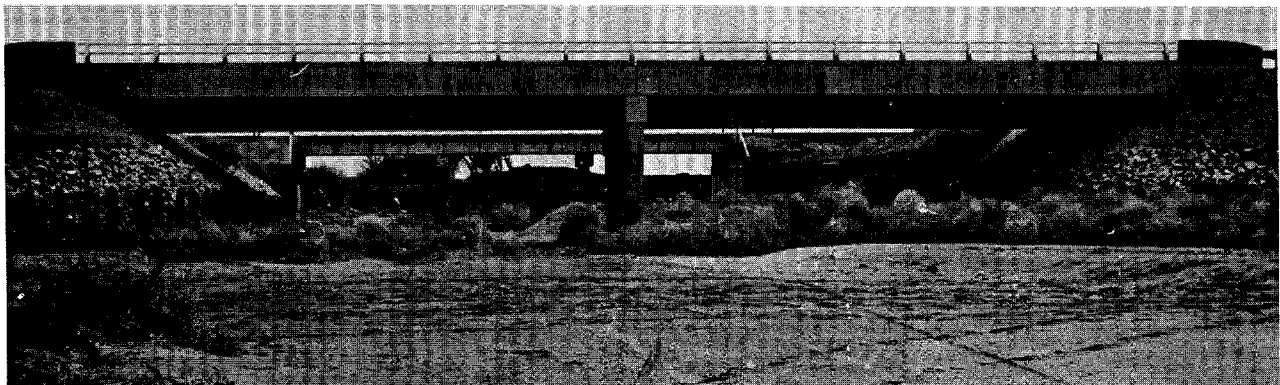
View upstream at new bridge constructed in 1973. (From Arizona Dept. of Highways.)
